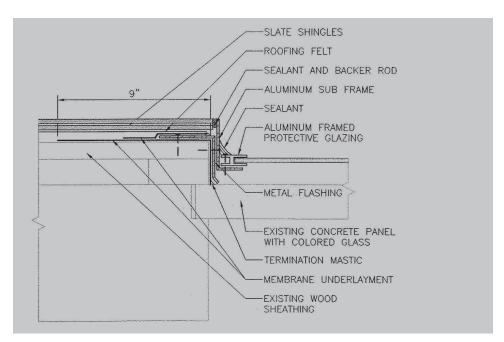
Aluminum Protective Glazing Construction Detail for Portal Windows in Slate. Hoffmann Architects, "Building Envelope Rehabilitation," 7/A6. The detail does not show ventilation. Direct access was not available to confirm whether the installed protective glazing was built as shown in this detail.
